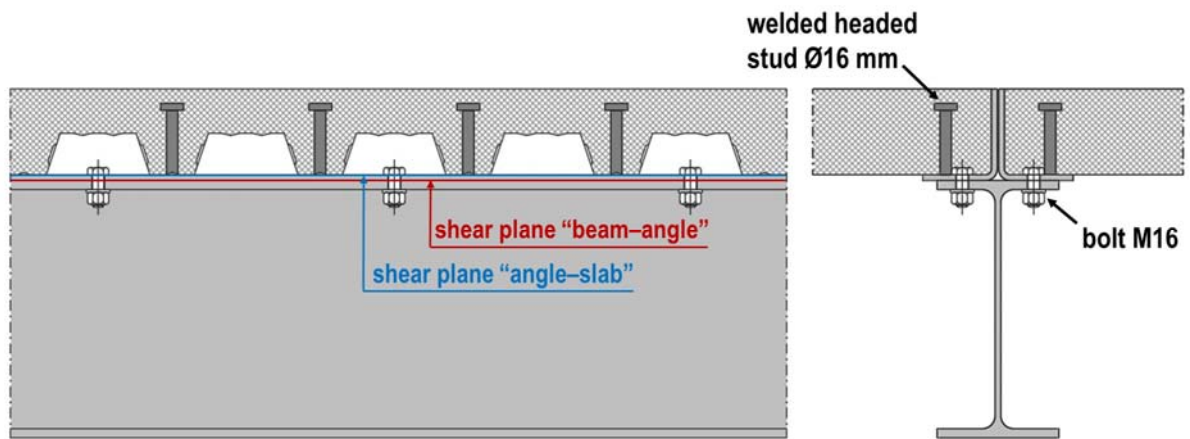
Floor structure demounting: separation of the slab from steel beams.
